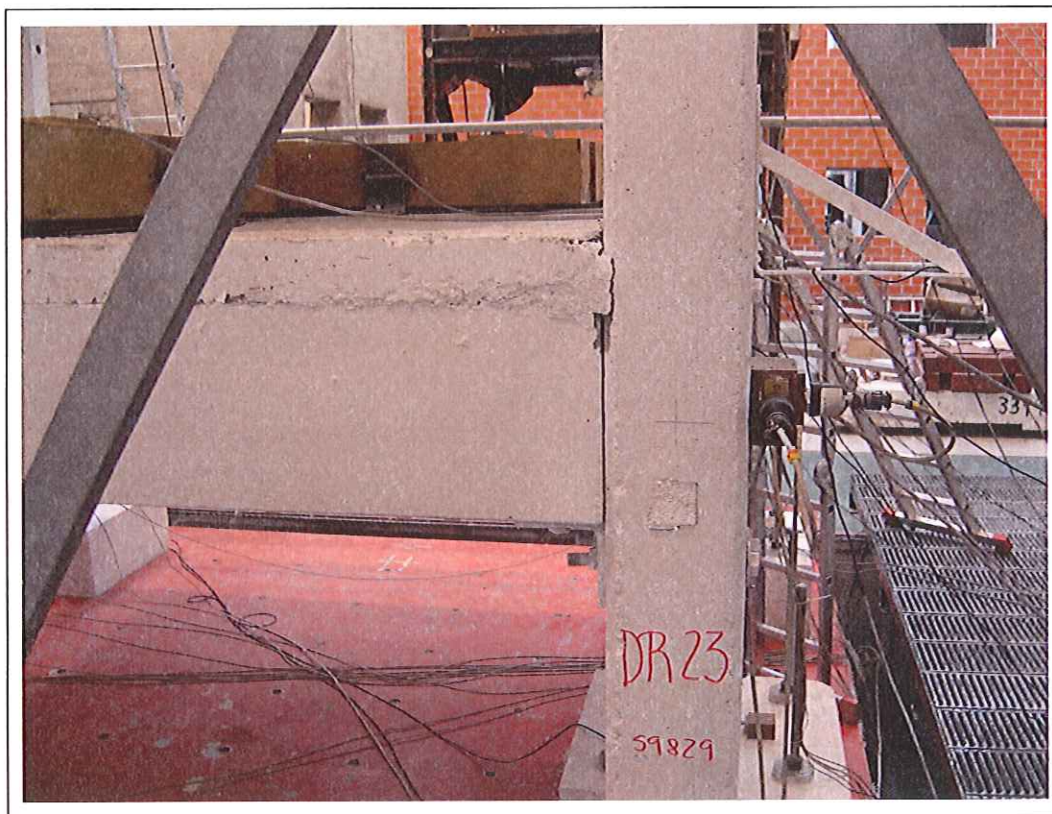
Detail of the beam-column connection after the test (J1-Trans.)
